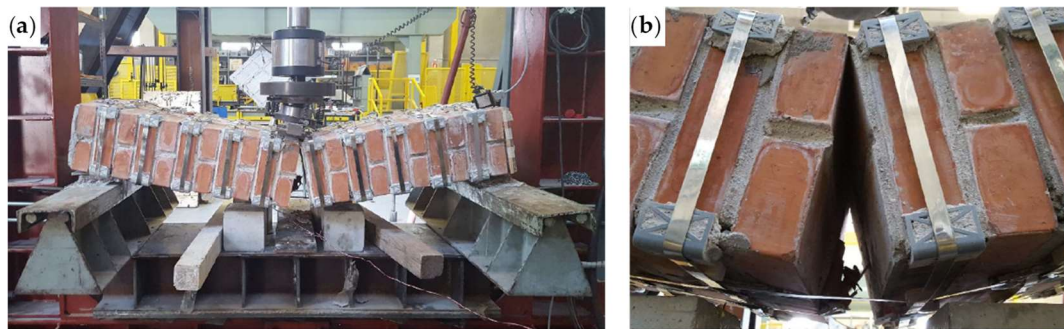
Specimen W1 at the end of the flexural test [1]: (a) overview of the disconnection mechanism and (b) detail of the disconnected cross-section: brick tear in the background.
